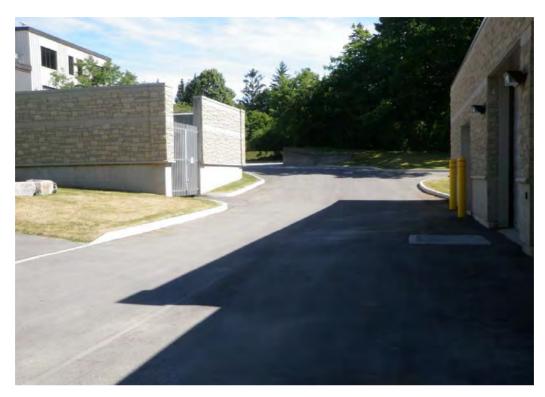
Area of disturbance, paved asphalt surface, building construction, facing northeast, August 5, 2015.
